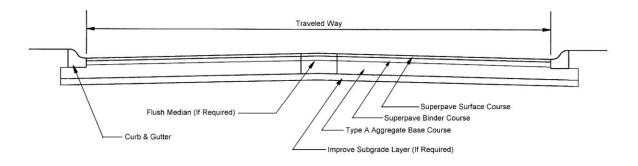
K and 44-3L illustrate typical LPA conventional flexible pavement designs.
